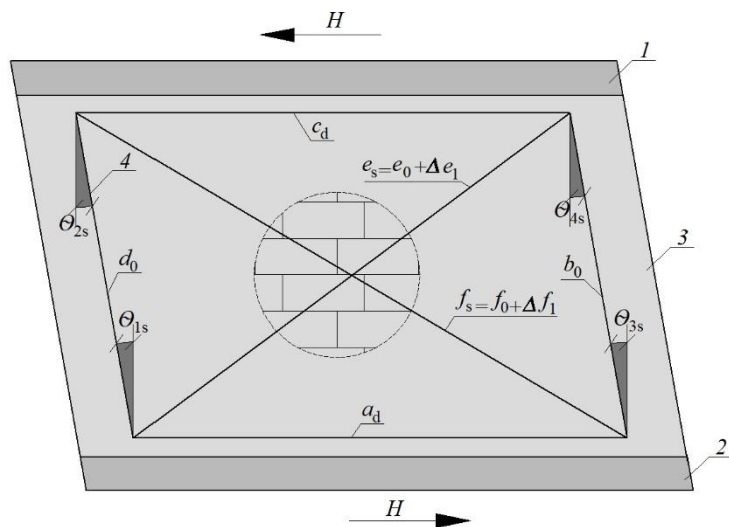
Deformation of measuring base resulting from shear deformation:  $H$  – horizontal shear force, 1 – rigid diaphragm, 2 – bottom beam, 3 – masonry wall made of AAC, 4 – measuring base before deformation, 5 – measuring base after deformation,  $a_d, c_d$  – deformed horizontal part of the frame system,  $b_0, d_0$  – undeformed vertical part of the frame system,  $e_s, f_s$  – deformed diagonal part of the frame system
